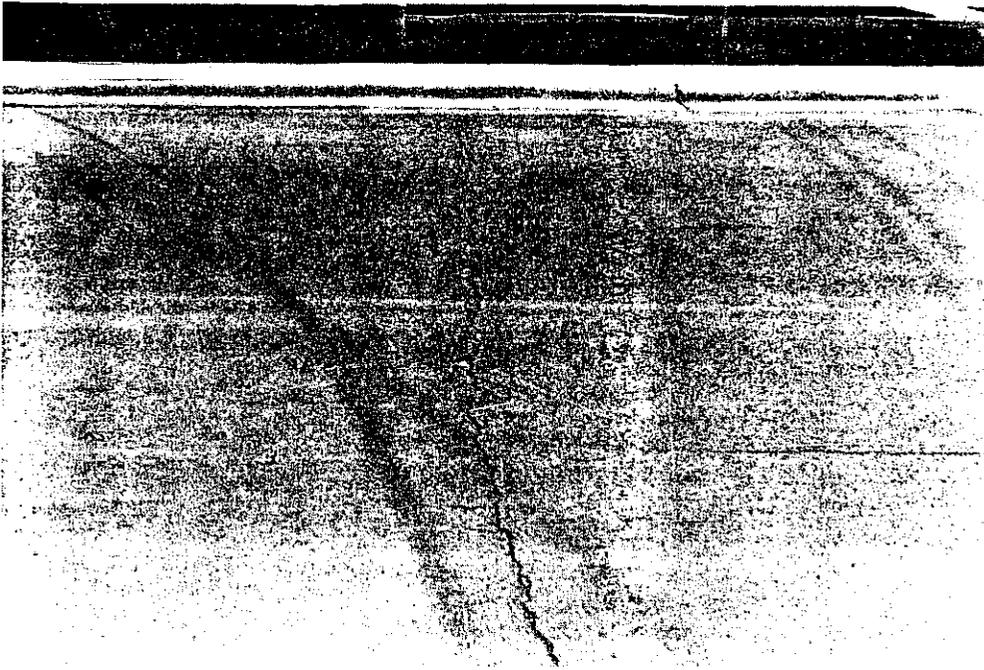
Typical Crack in Petromat Test Section, Douglas St., Freeport.
